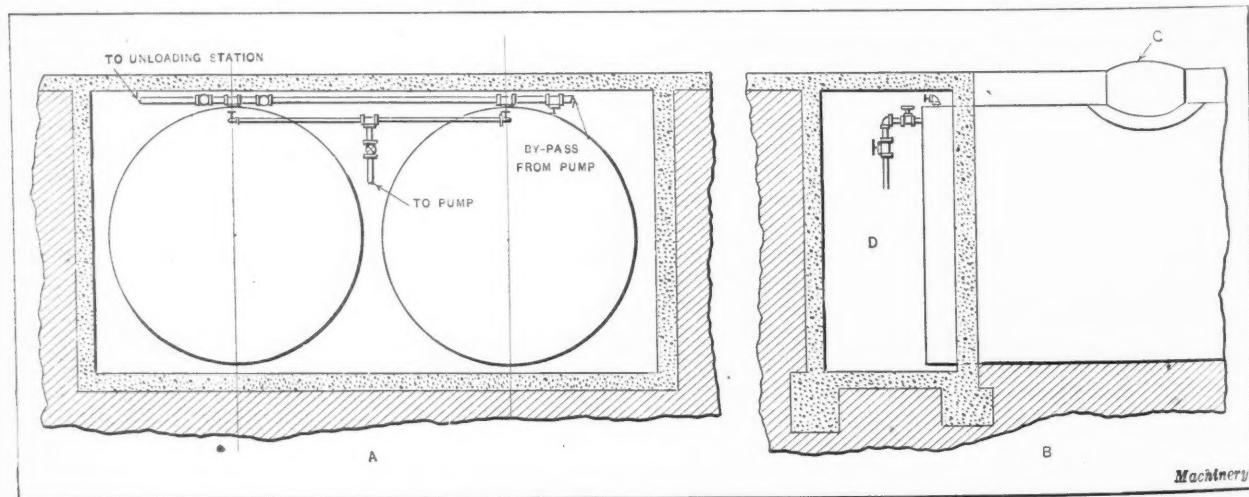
Plan and Side Elevations, showing Arrangement of Underground Fuel Tanks
